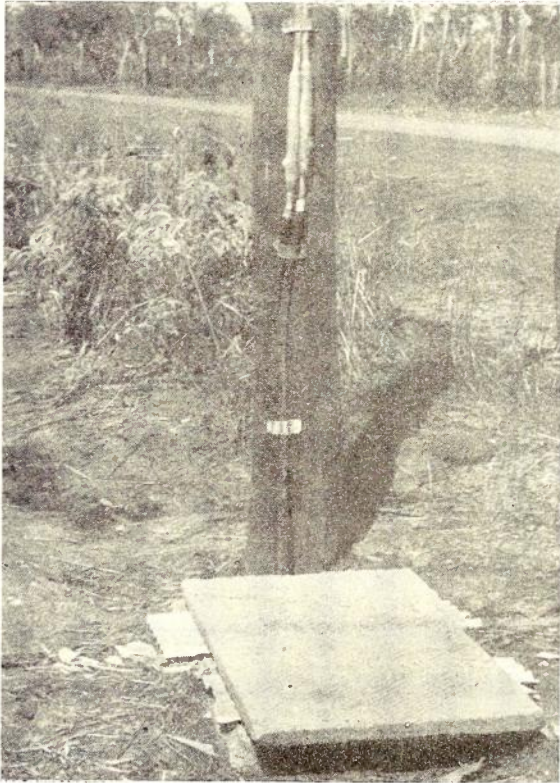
Junction between aerial and underground cables. Gas-tight seal in jointing pit with raised cover.
